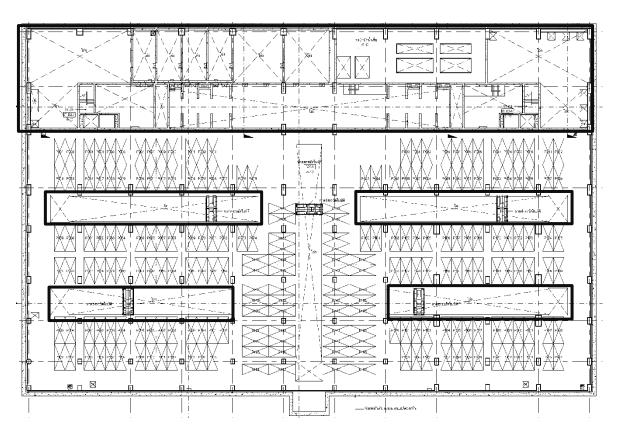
B2 floor plan (openings are marked with bold rectangular boxes)
